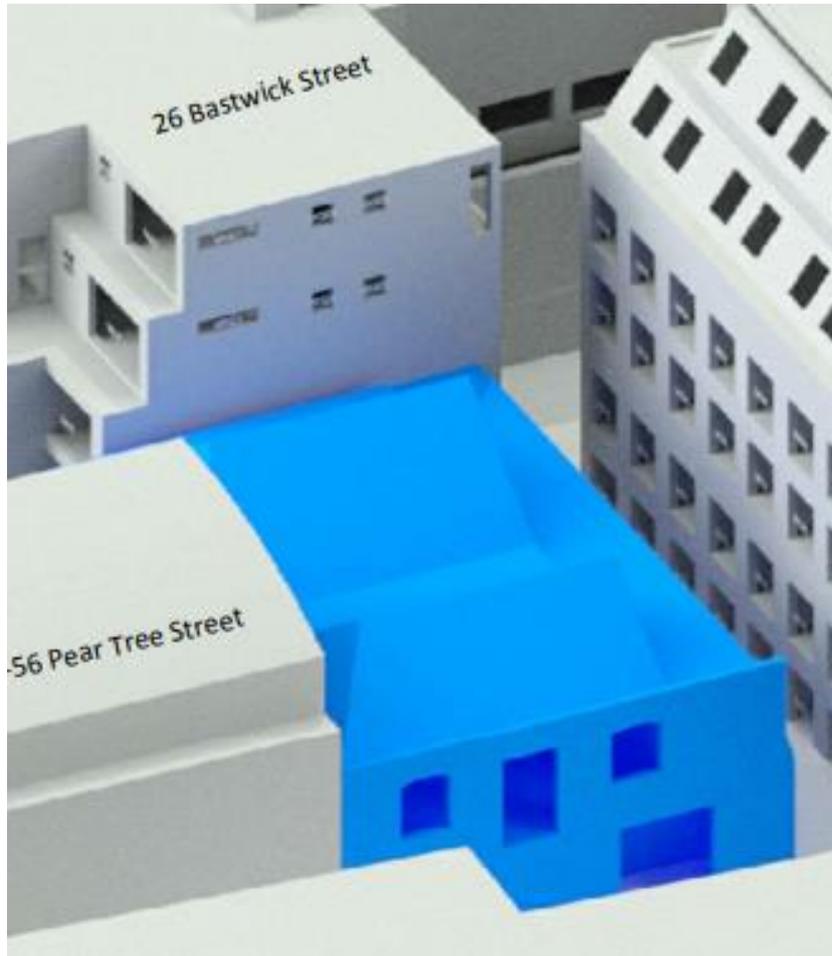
Relationship of 6 windows in 26-27 Bastwick Street with existing host building
